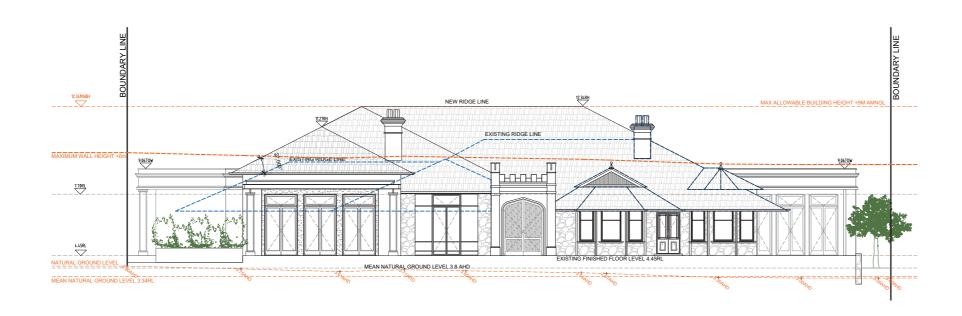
52 The Esplanade, North Elevation - Existing and Proposed (Source: Philippa Mowbray Architecture & Interiors 2023)
